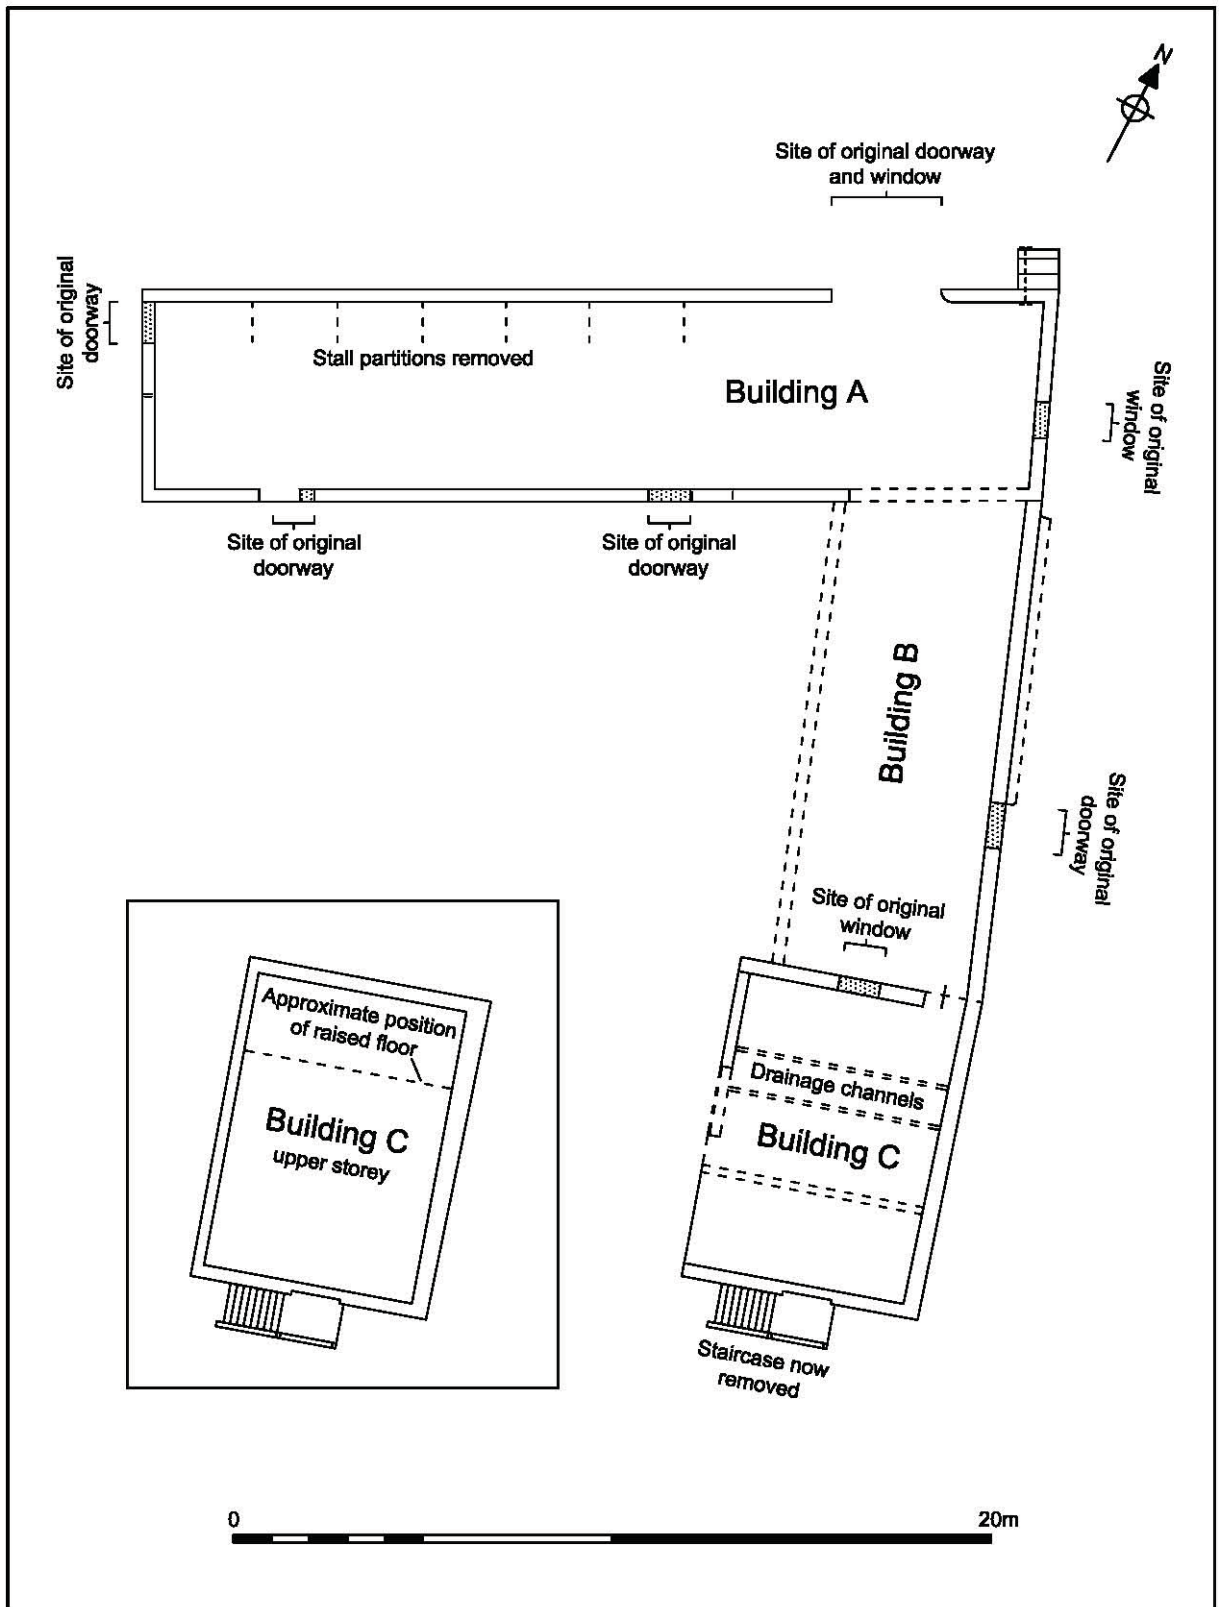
Plan of The Old Dairy buildings. Scale 1:200
